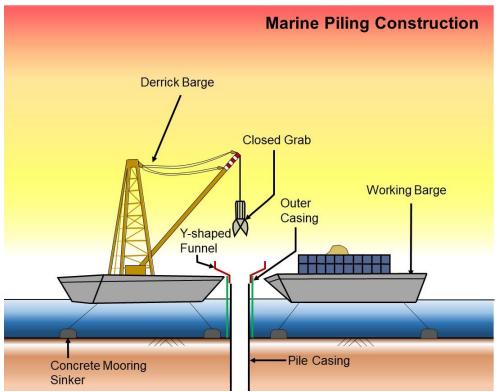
Outer Casing for Marine Bored Pile Construction
